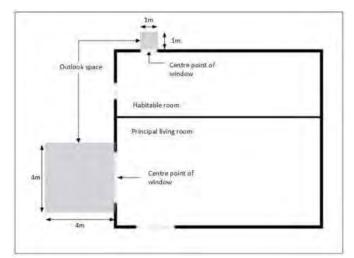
outlook space requirements for development containing up to three dwellings (H5.6.12.A1 & H6.6.13 A1)
